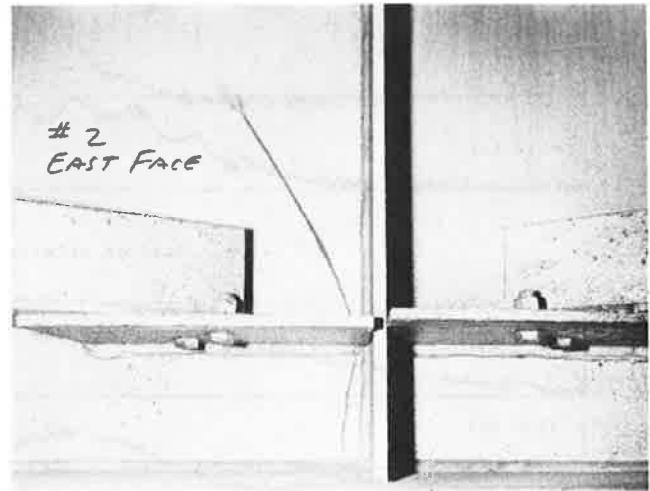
Typical crack growth from gusset plate gap.
